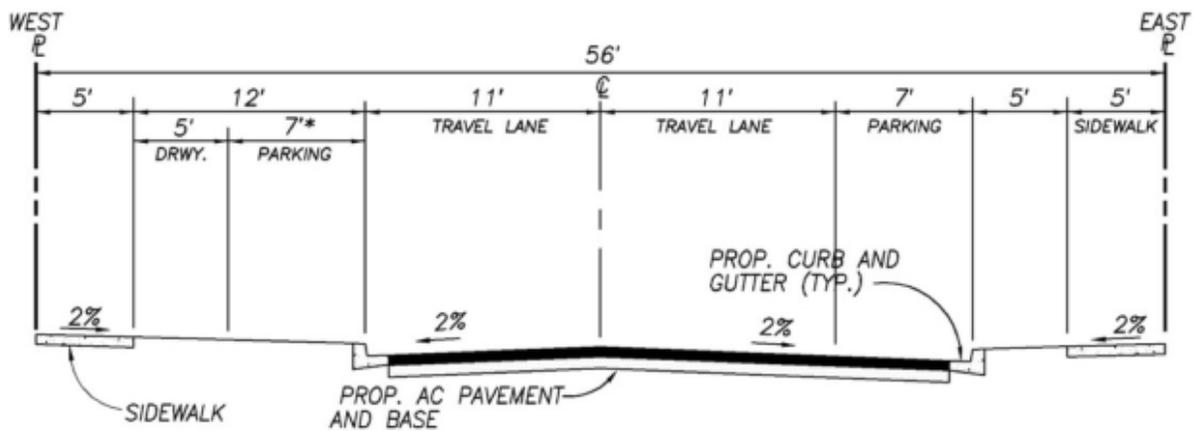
a, Street Sections - FC-2 Town Center Drive
